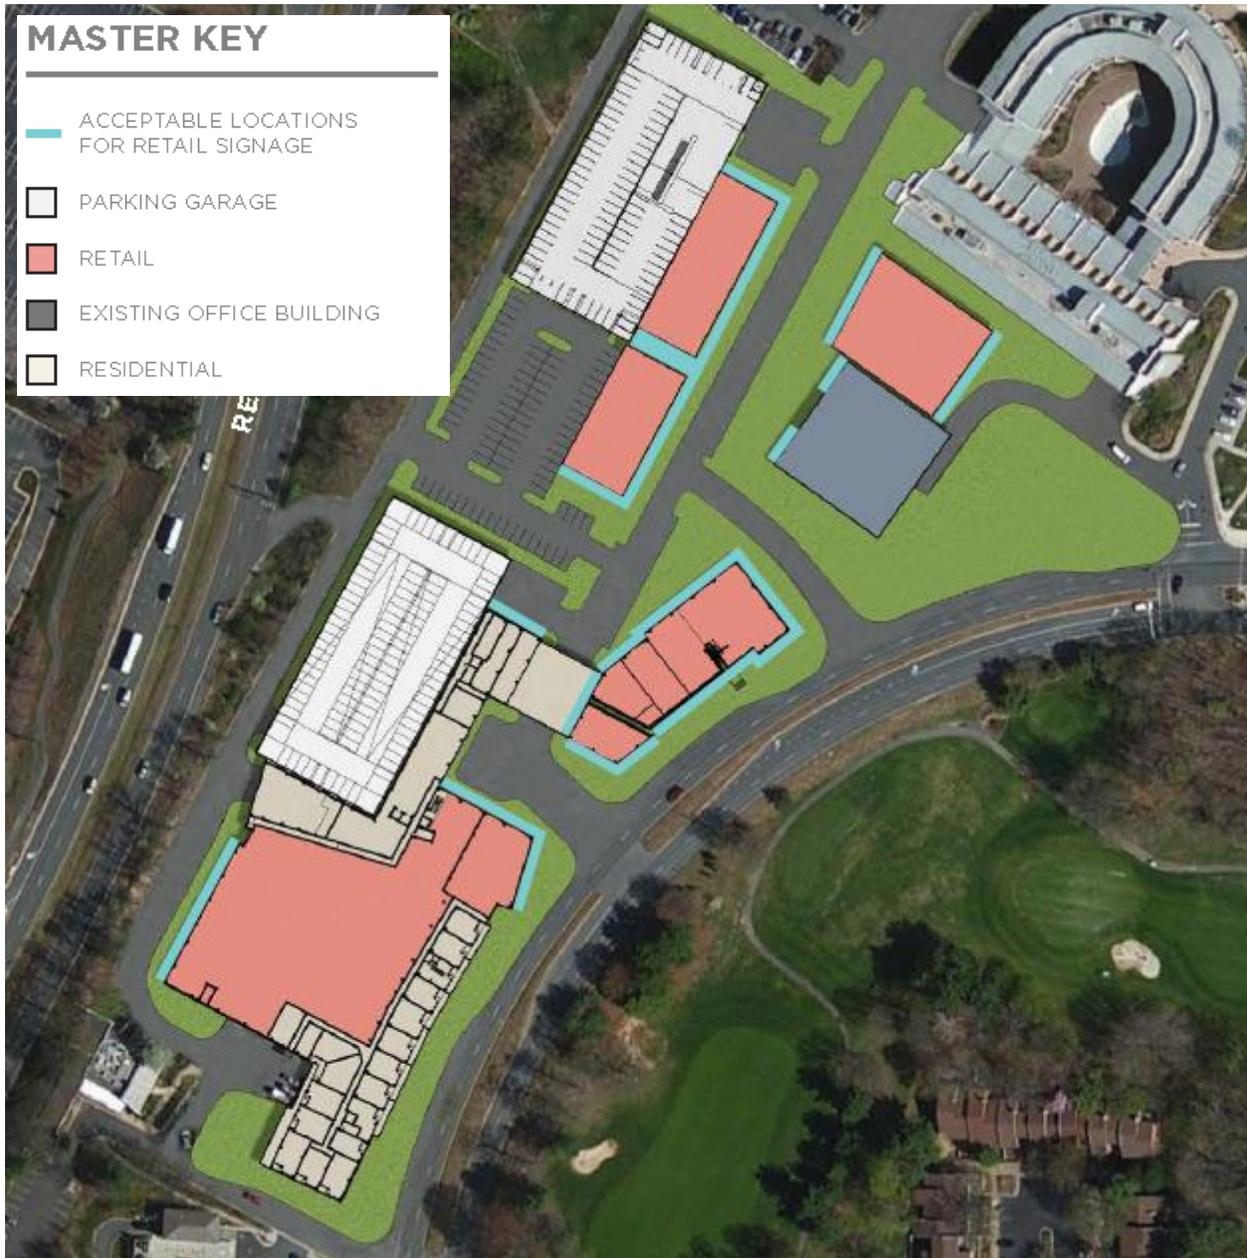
The CSP proposes retail signs to be potentially located along the facades depicted above, as shown on Sheet 38. (Source: JBG Companies/Streetsense, January 20, 2015)
